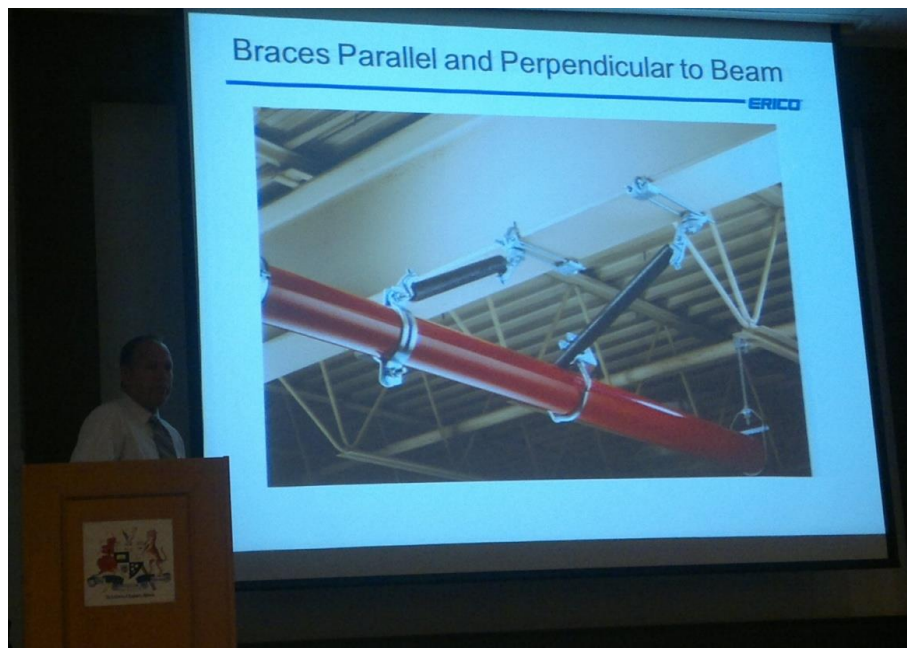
Mr. David Jeltres explaining about seismic bracing for sprinkler piping
